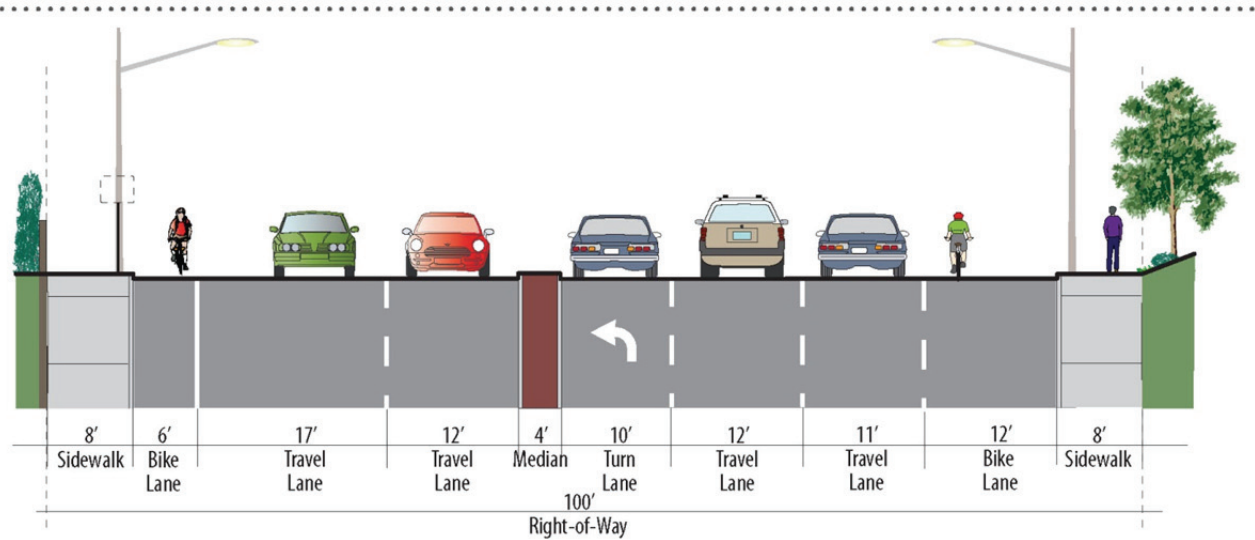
Proposed Bikeway Improvements, Section D – Thousand Oaks Boulevard
